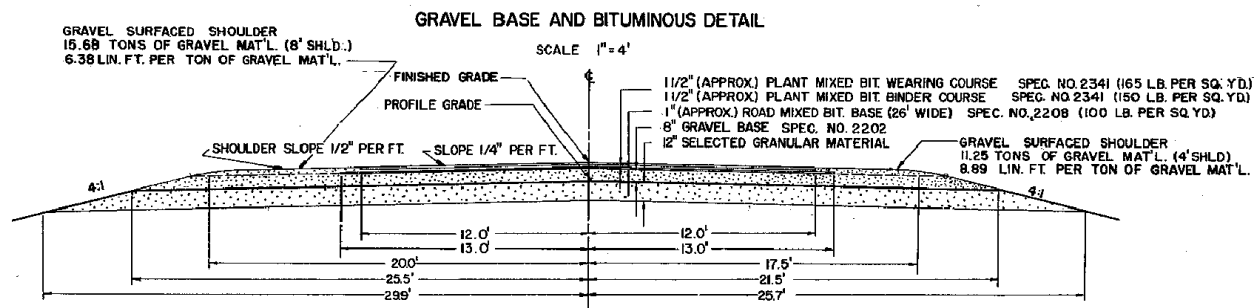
TH 36 mainline typical section (1958 construction plan)
